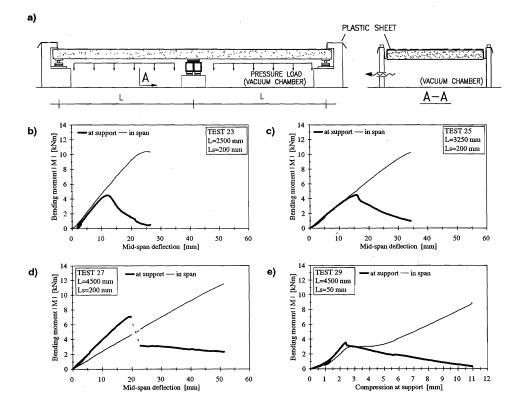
Experimental bending moment - deflection curves of full-scale two-span sandwich panels loaded using the partial vacuum chamber. The first failure modes in the tests were the shear failure (Test 23), the core crushing failure (Test 25 and Test 29) or the face bending and buckling failure (Test 27).
